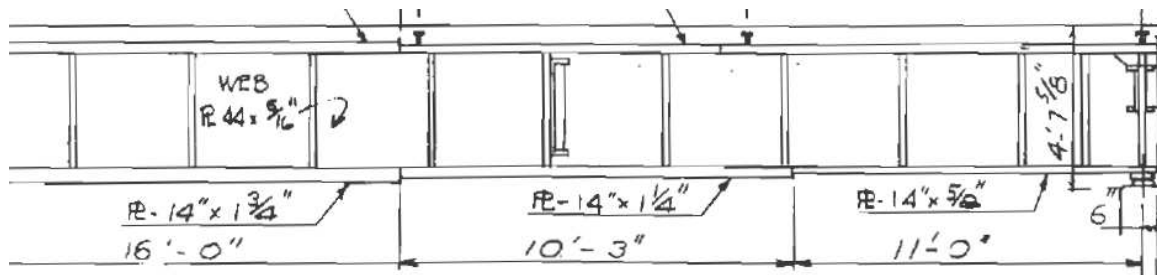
Plate Girders in Construction Documents for Bridge B-16-FM (Courtesy CDOT)
